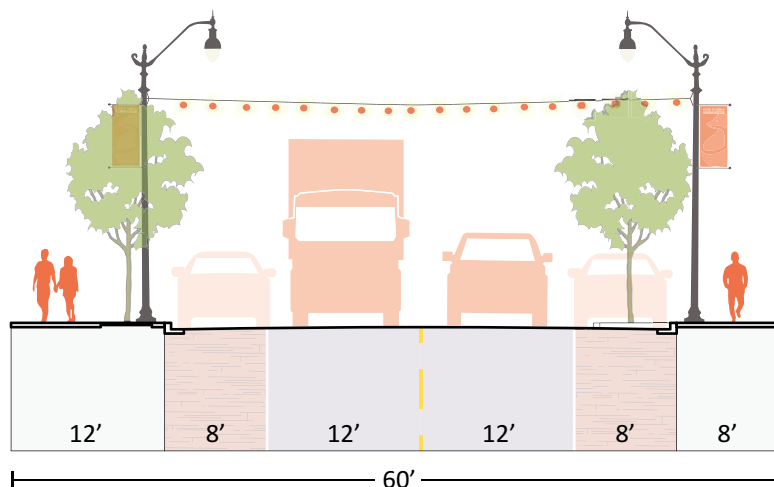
C (1). Van Emmon Street (Long-term).
